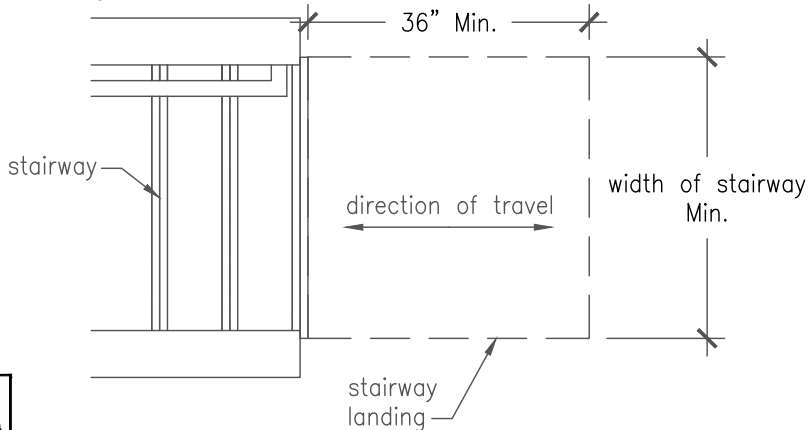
STAIRWAY CONNECTION TO DECK DETAILS
